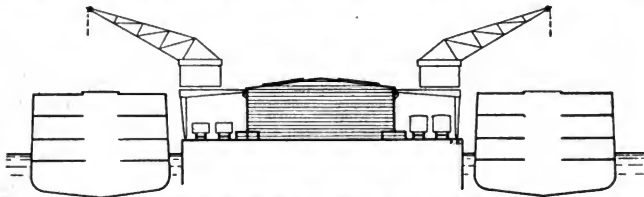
Shows a typical arrangement for unloading machinery, such as is installed on the new docks at Hamburg, Bremen and many other European harbors.
